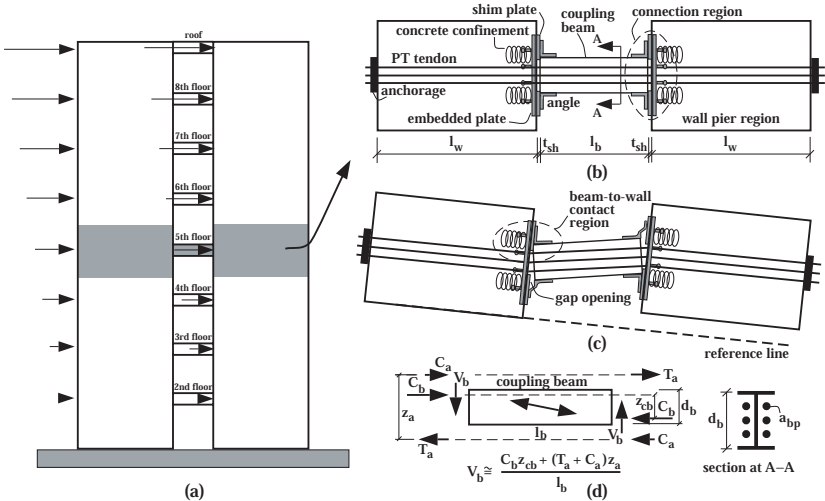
Post-tensioned hybrid coupled wall structures – (a) multi-story wall system; (b) floor subassemblage; (c) idealized exaggerated displaced shape; and (d) coupling forces.
